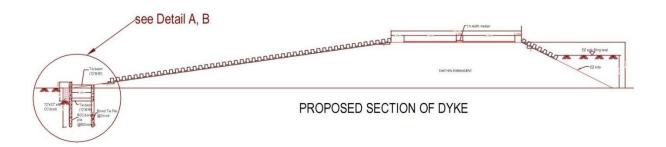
Detail of Dike at Sea Side with Tie Beam (Detail A)
